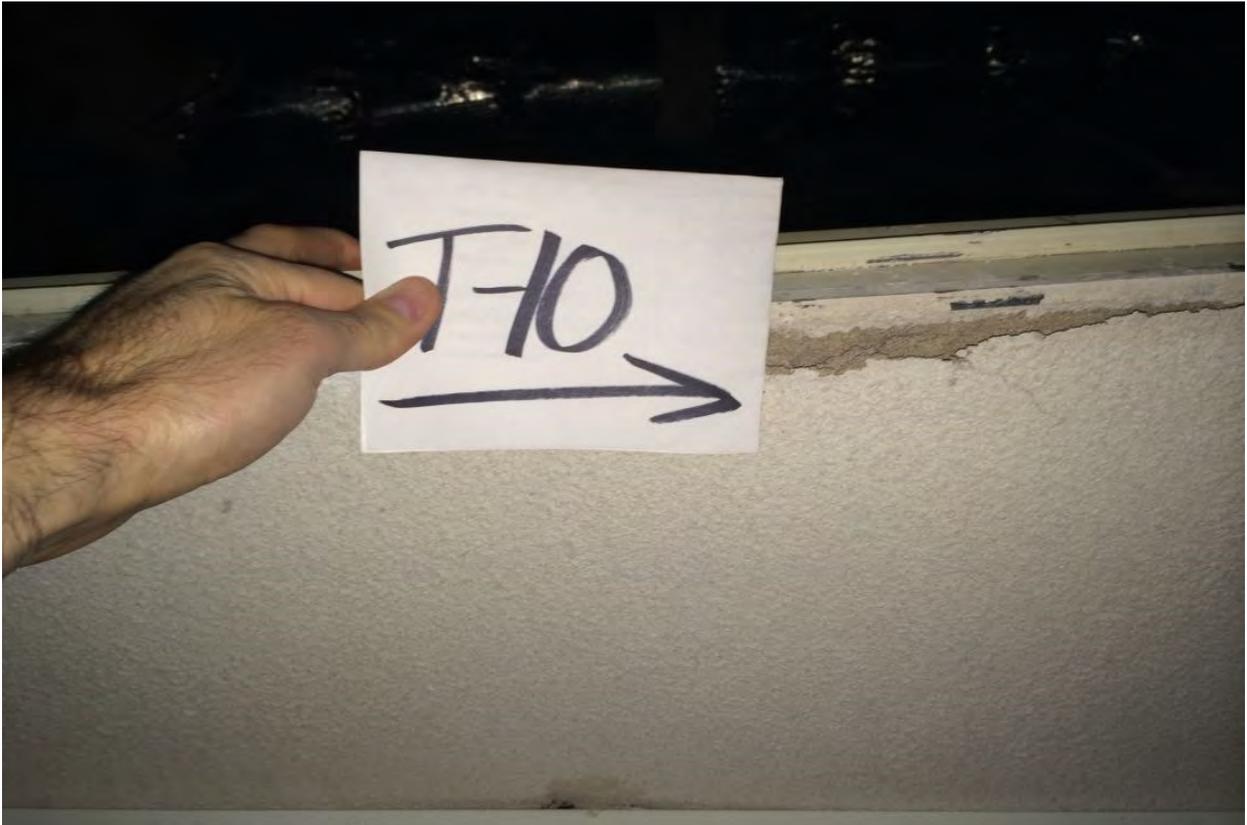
Laboratory analyses detected 20% chrysotile asbestos within spray on surfacing material sample TS-10 collected from the Theatre Building upstairs projection room ceiling.
